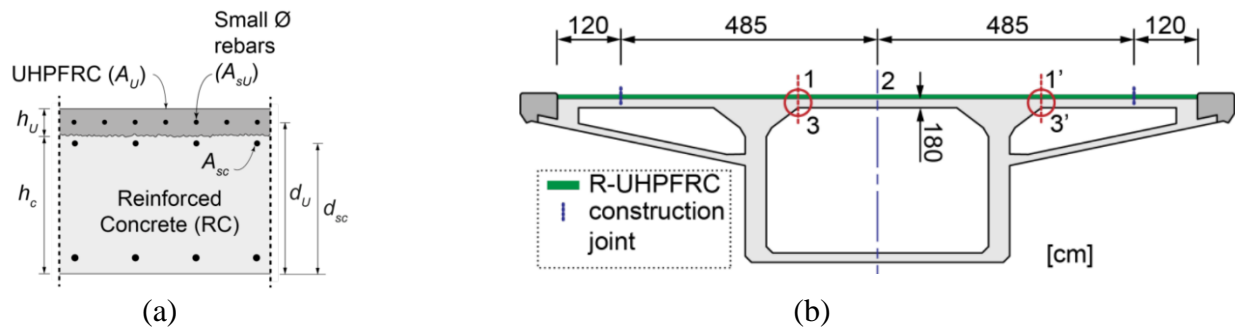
Cross-section details of the project: (a) typical composite cross section and (b) geometry of the box girders cross-section
